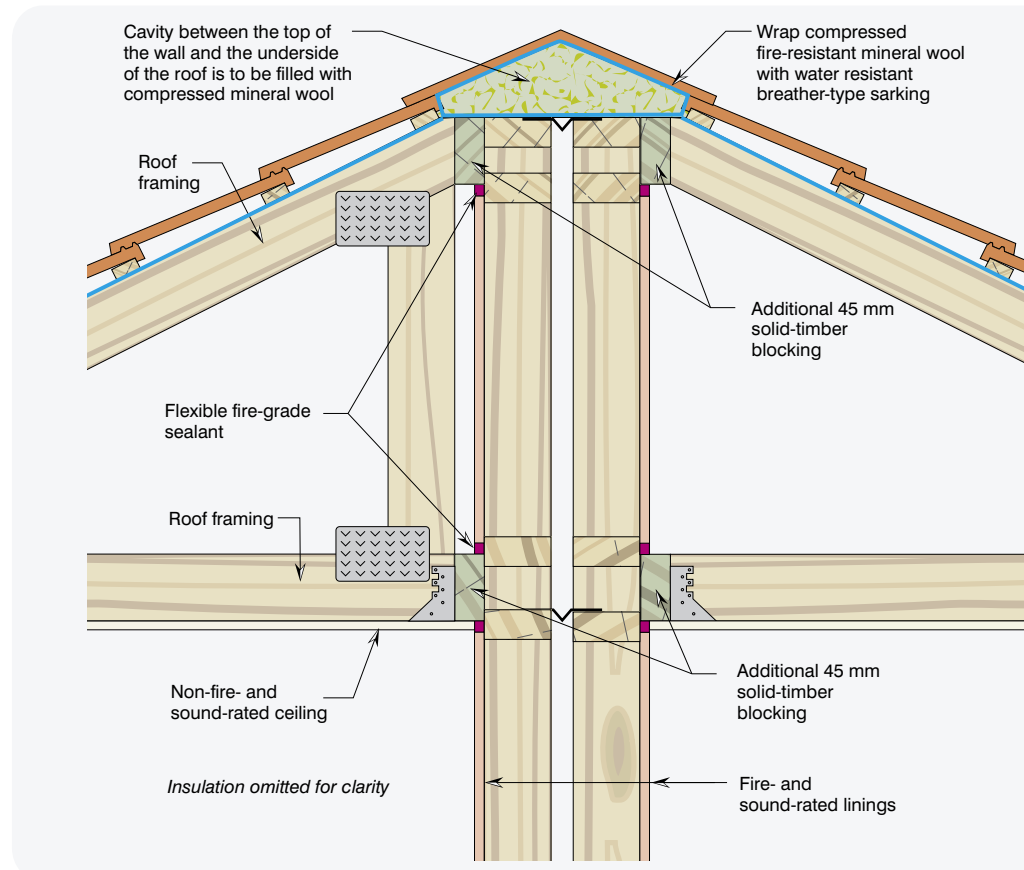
Trusses or roof framing support off separating wall – elevation view.
